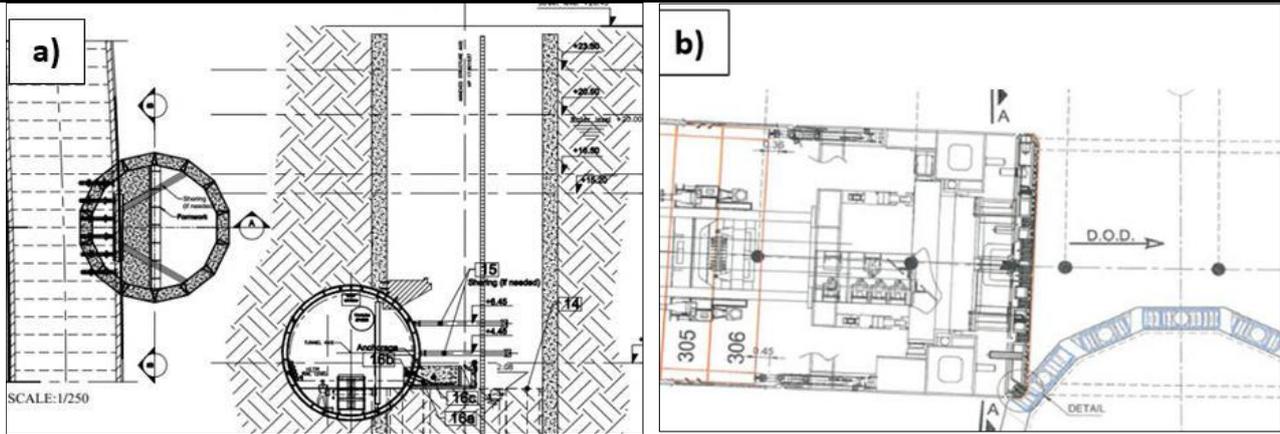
TBM 2 crossing annexed structure 11-B, Lot 11-c: (a) vertical section; (b) plan view.
